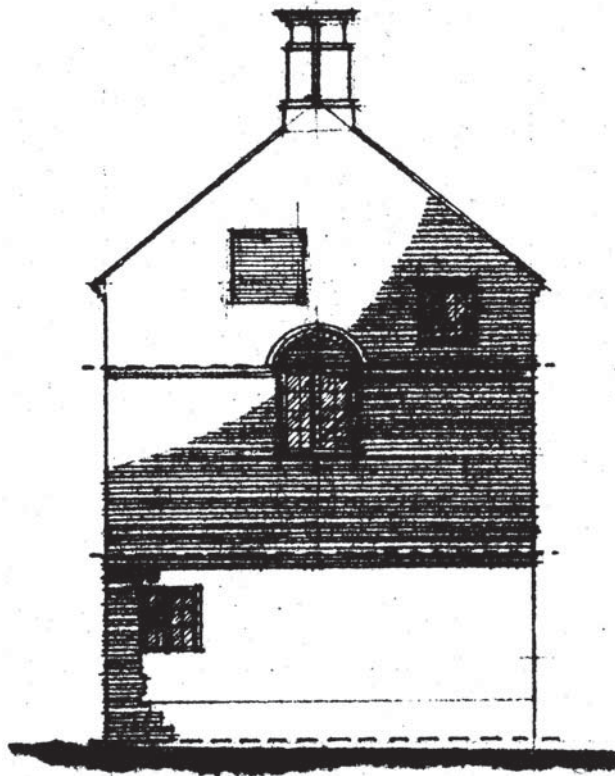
Proposed gable elevation (Haywood Exclusive Homes).
